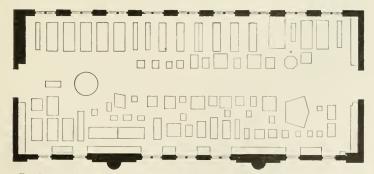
American Museum of Natural History. Floor plan of the Mexican hall.
